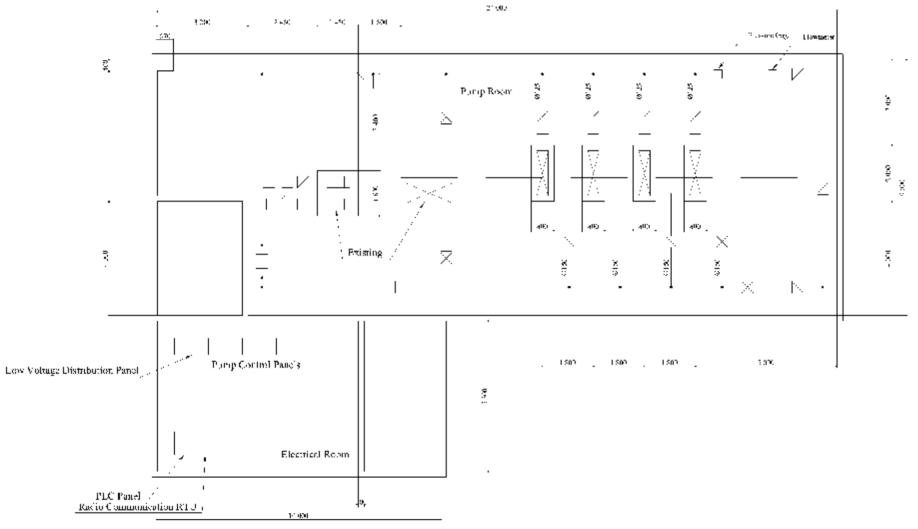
Improvement plan for Mirzo Ulugbek PS
